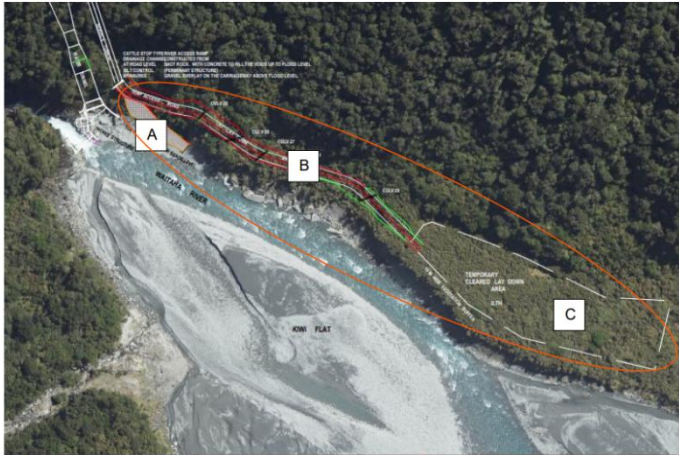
Access Road and Construction Staging Area 1 at Intake
